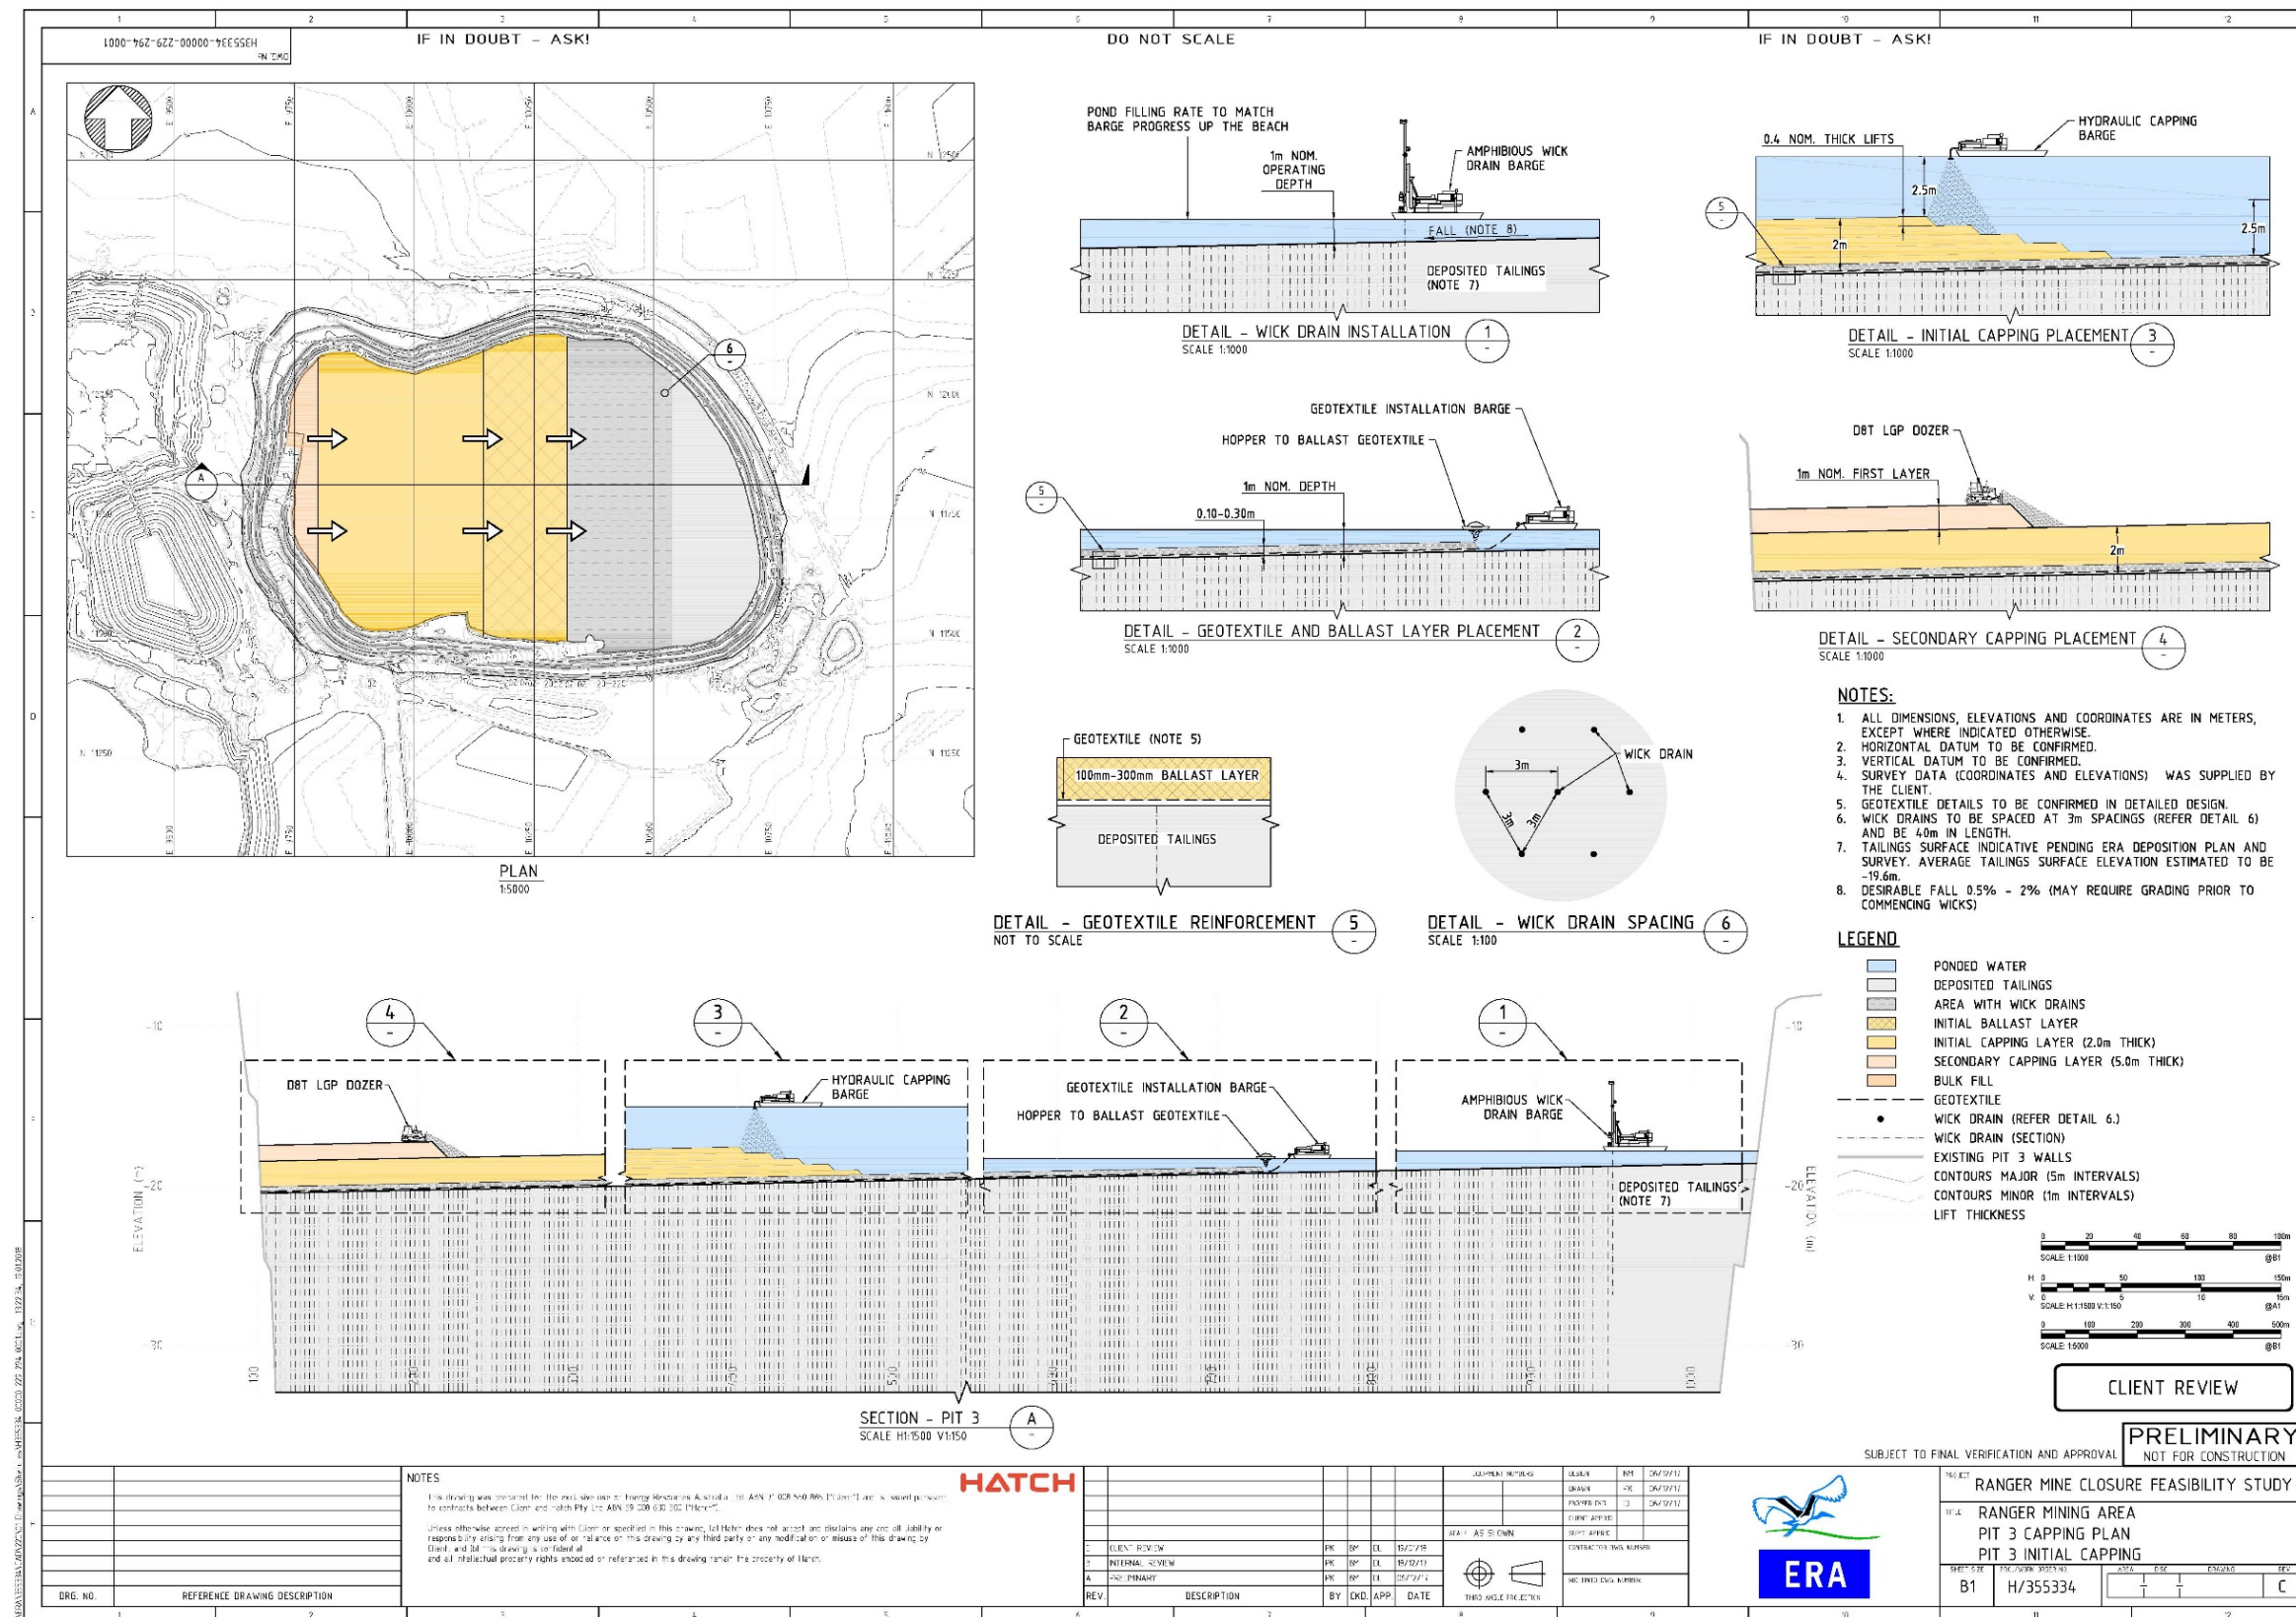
Indicative Pit 3 wicking, geofabric and initial capping plan.
